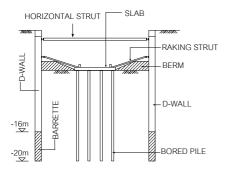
Tender stage bracing system – diaphragm wall was designed with soil-berm and 2 struts support (horizontal bracing and raker)
